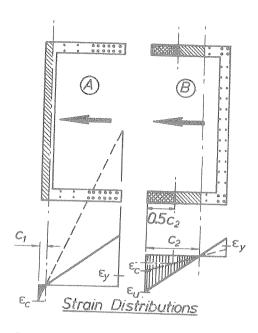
Strain Profiles for Channel Shaped Wall Sections.
